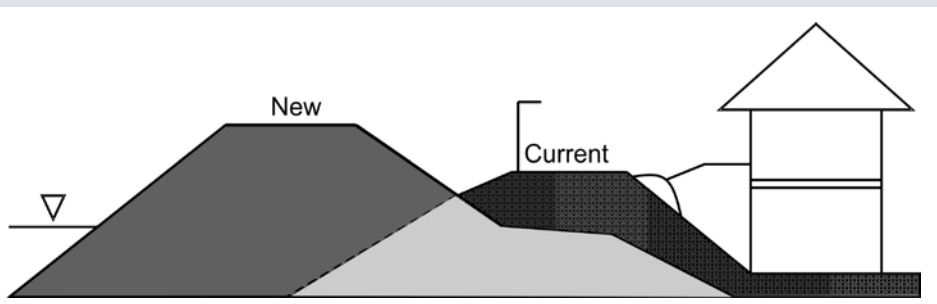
Cross-sectional view of the current levee section (Figure 4.5) and one of the new levee sections that is proposed to be built to provide the additional flood risk mitigation required for the future
